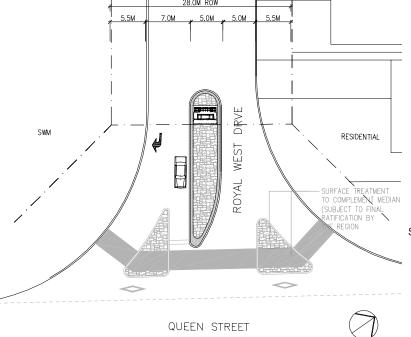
Concept Plan of Primary Gateway Feature #4 (Queen Street West & Royal West Drive)
